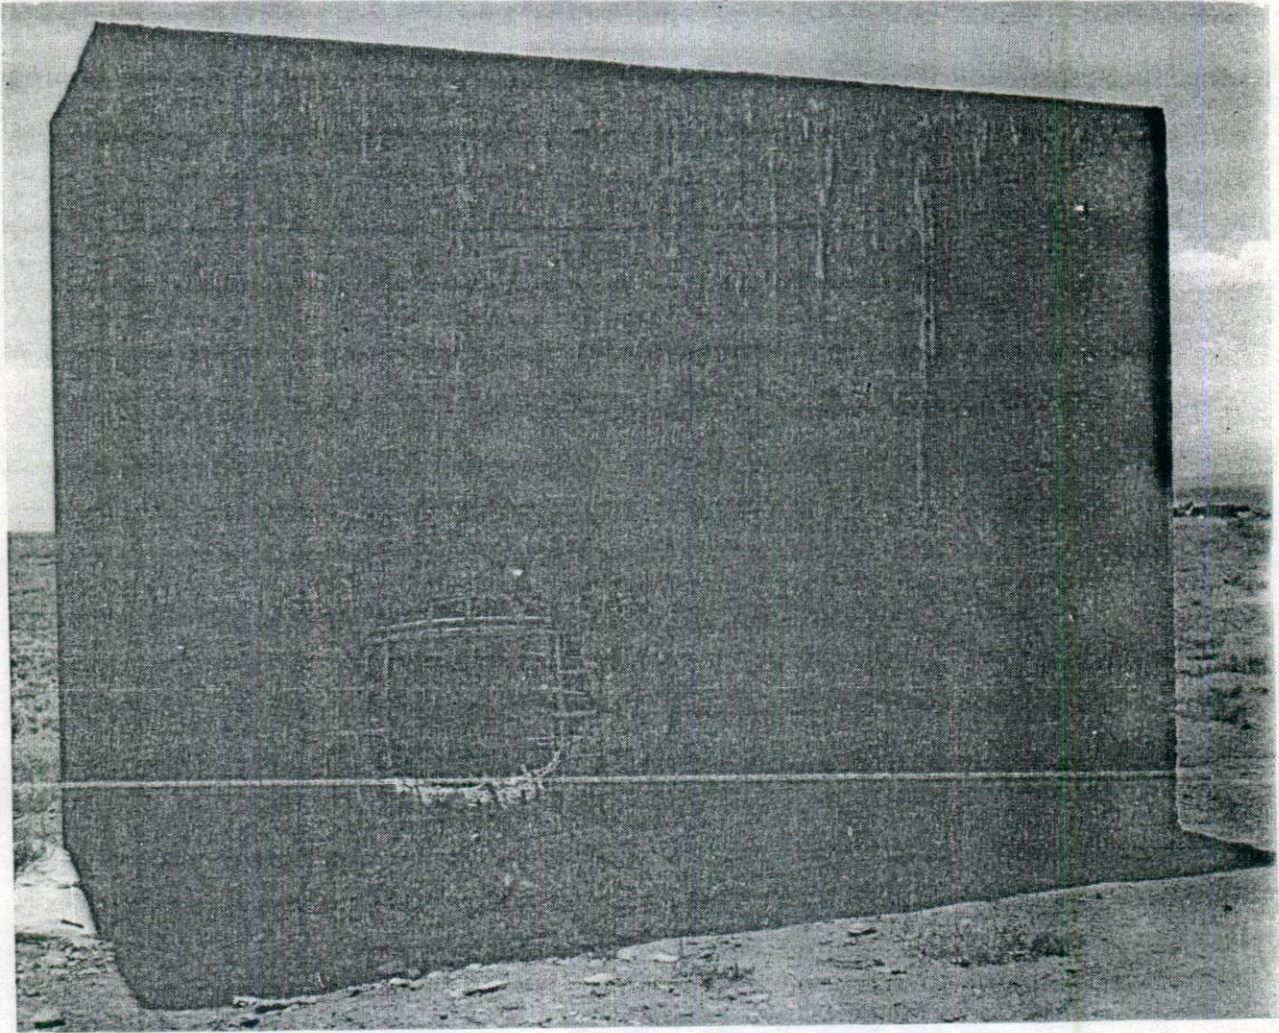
Eighteen-Inch-Thick Reinforced Concrete Wall Penetration
